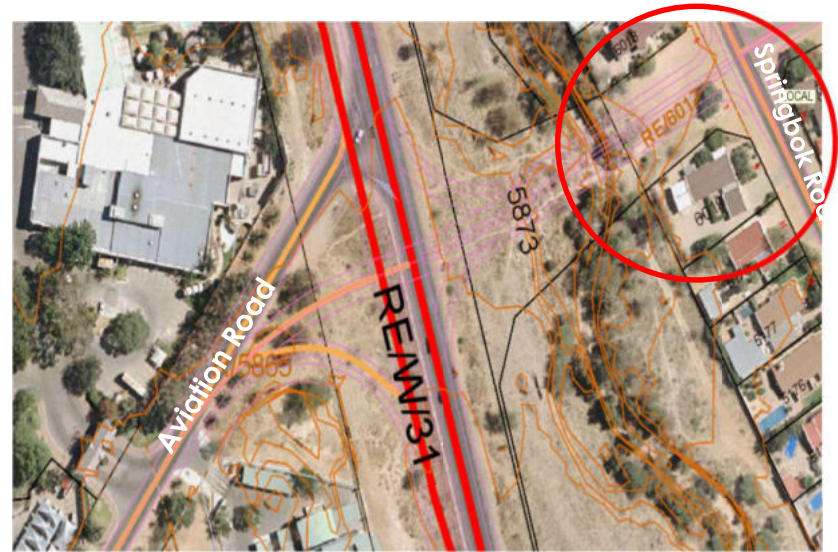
Erven 6018 and 6019 will have a new road passing due to the new link between Aviation Road and Springbok
